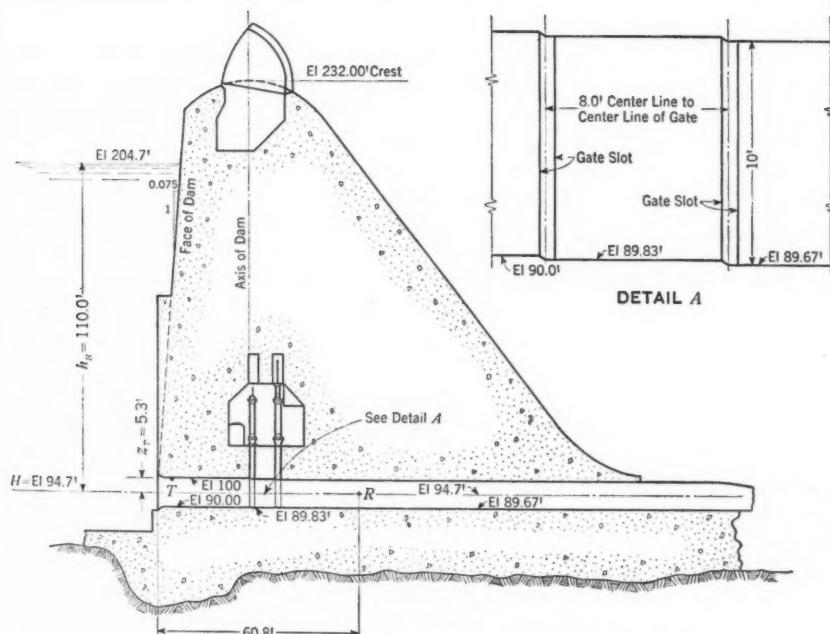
SECTION OF MADDEN DAM SPILLWAY AND CONDUIT.
